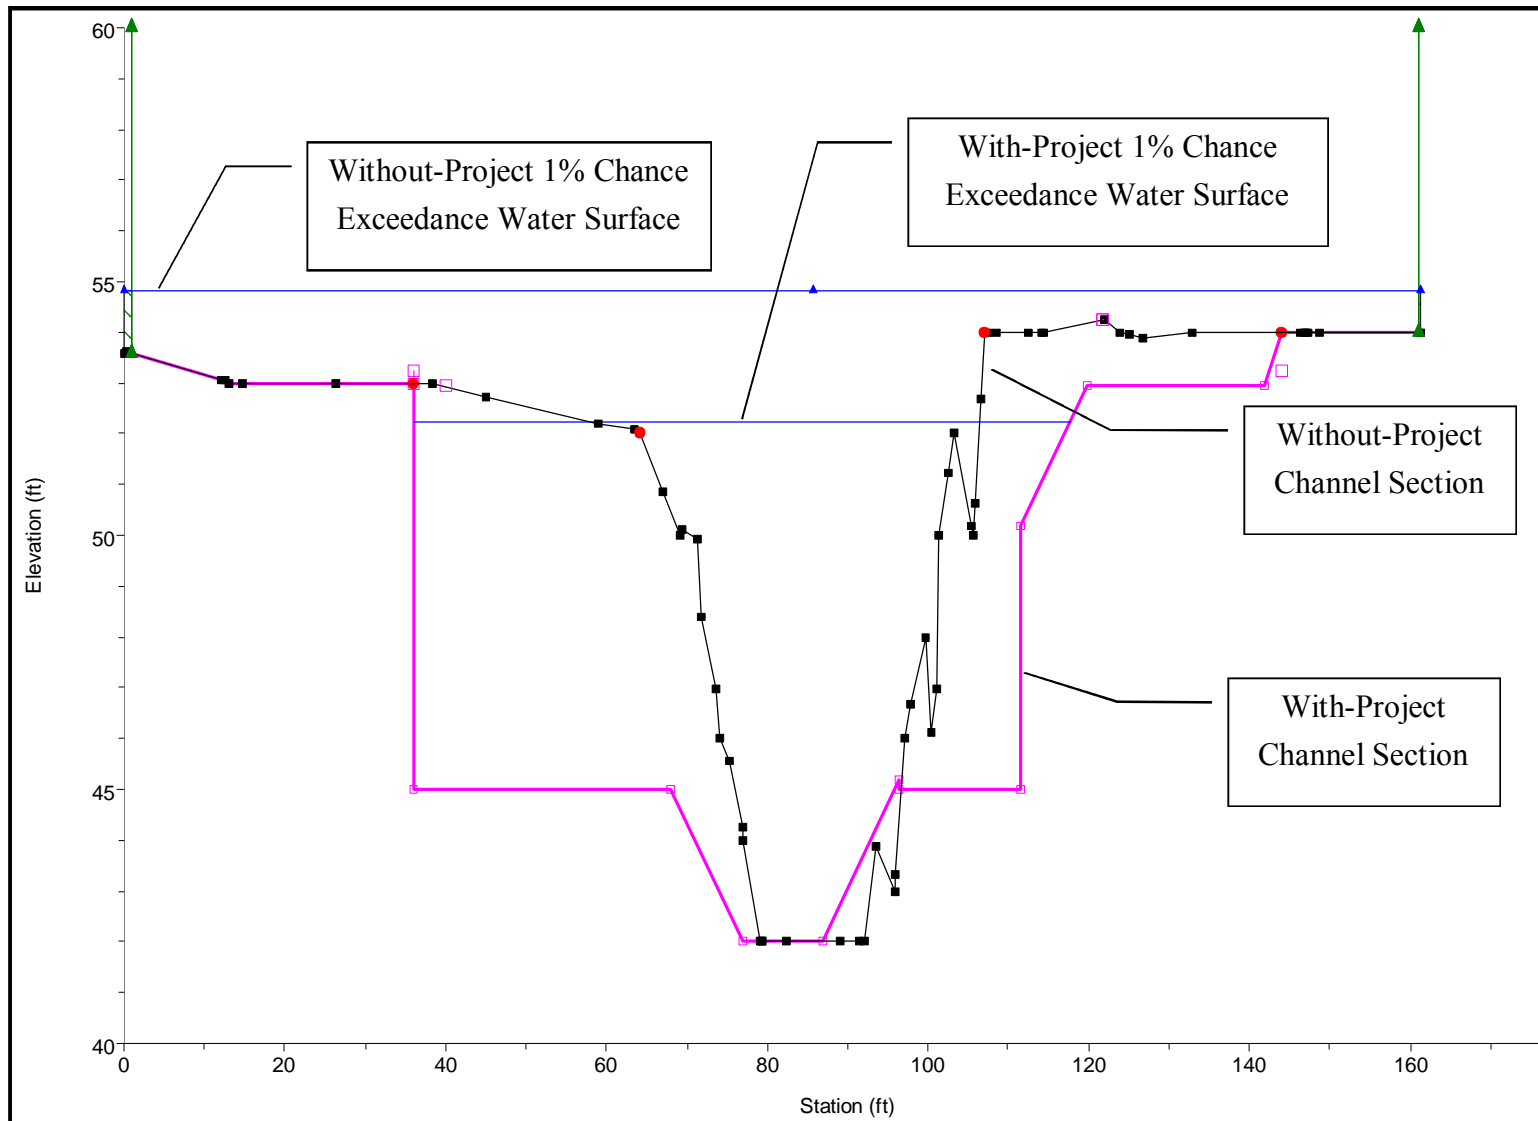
Typical D/S section, with- and without-project geometry for Alt. 4B
